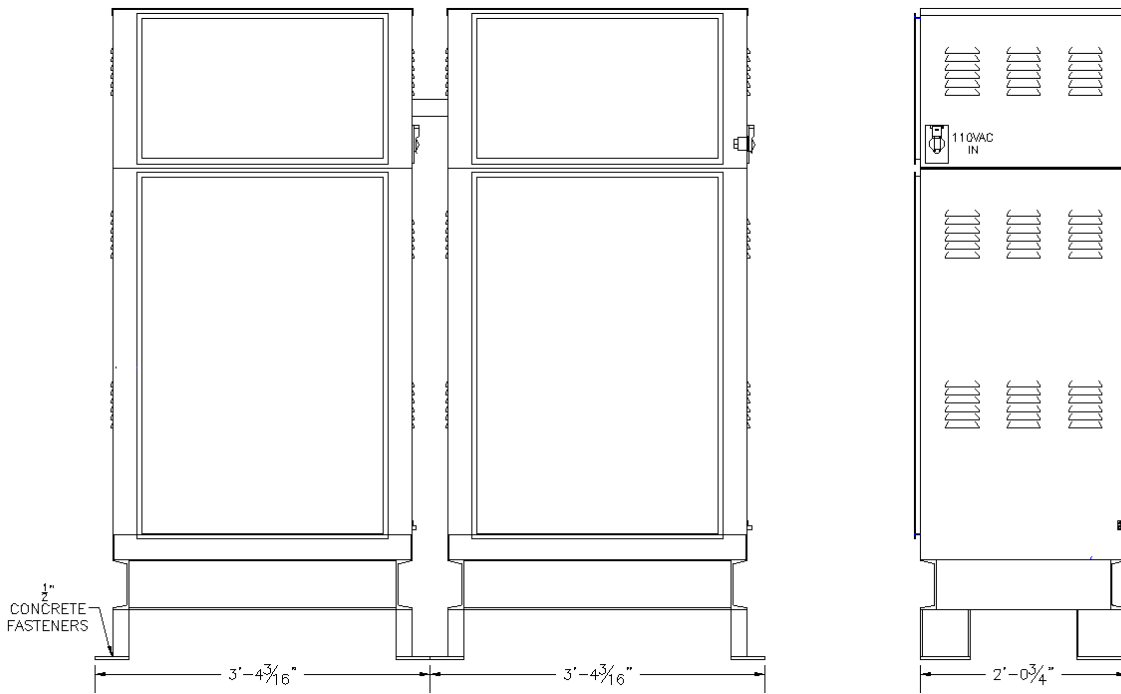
A: UPS ENCLOSURE INSTALLATION DETAILS (200019 – PO-UPS-505-3)
